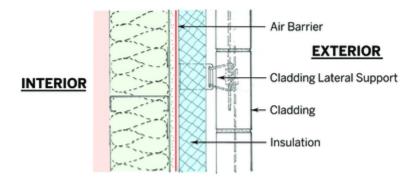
(EN35) Wall masonry attachment – Cladding Lateral Support Figure Created by Keith Boswell, FAIA
